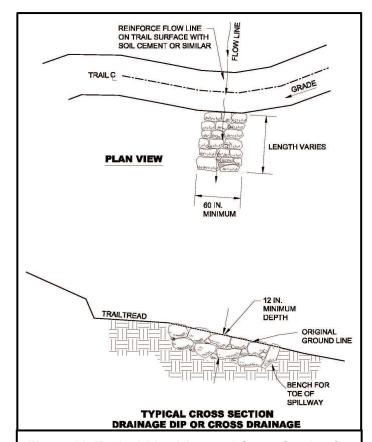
Typical Plan View and Cross Section for Drainage Dip or Cross Drainage
